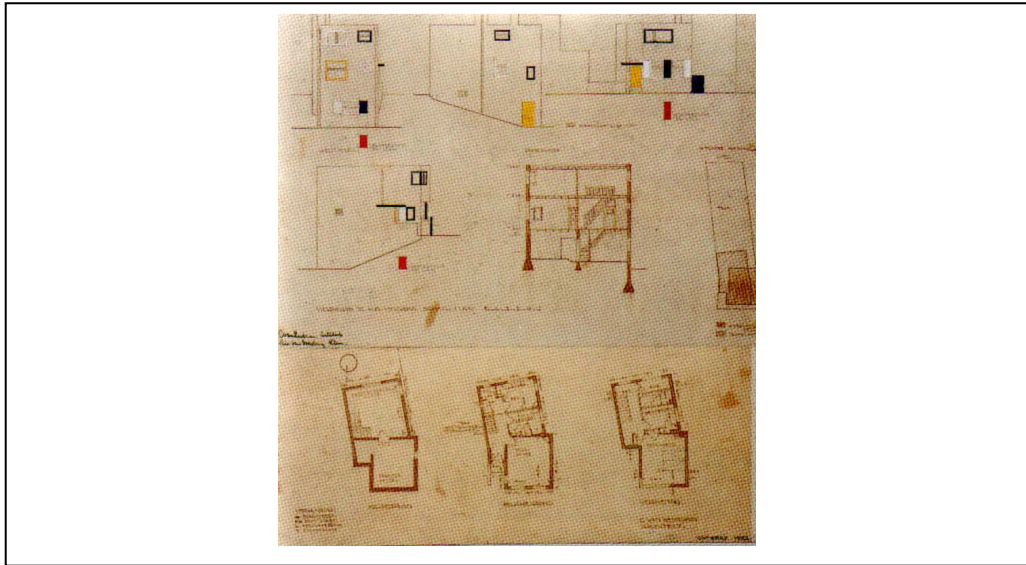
Van Doesburg's color scheme of Cornelis van Eesteren's house, Ablesserdam, 1924. Elevations, cut-away and plans. (Source: Overy 1991).
